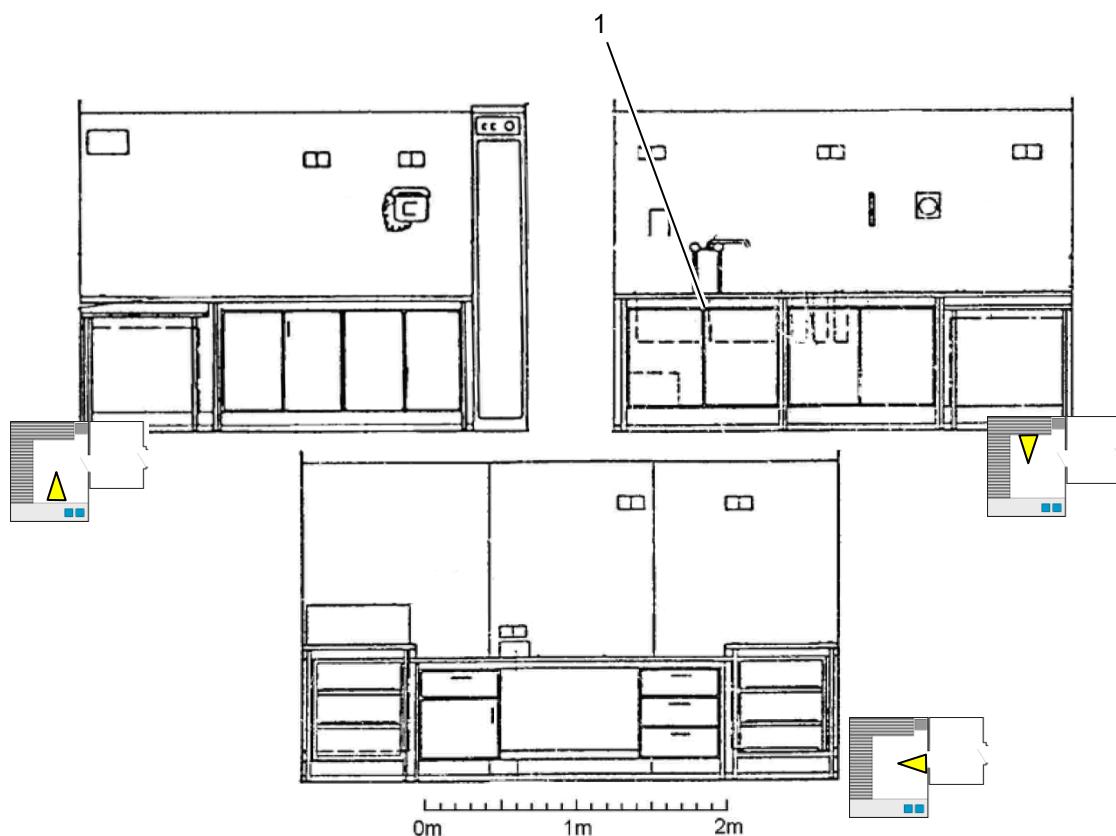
Darkroom area of dark room 3 (detailed plan laboratory walls,
